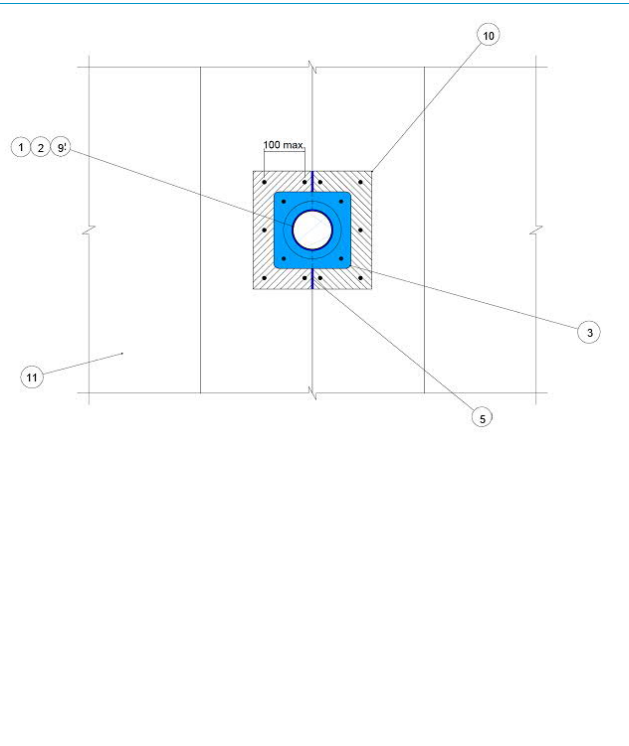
Plastic pipes up to Ø110 mm (elevation)
